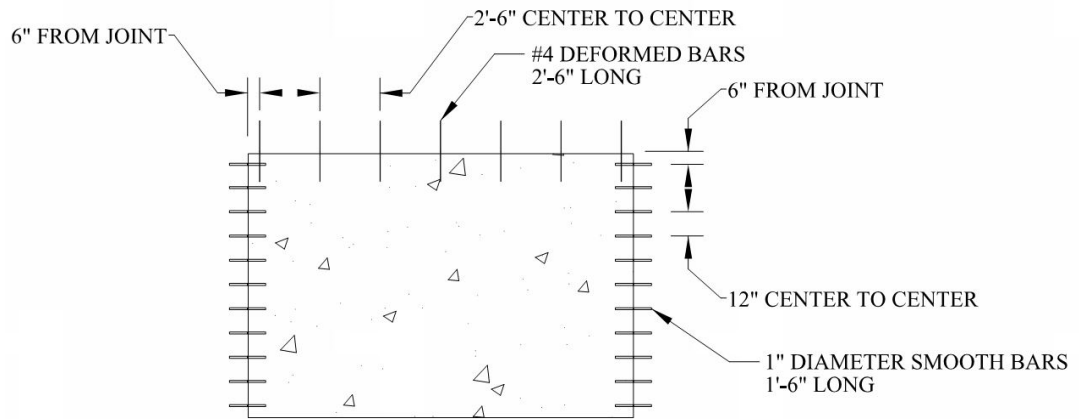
Dowel Bar Placement in all Concrete Panels
